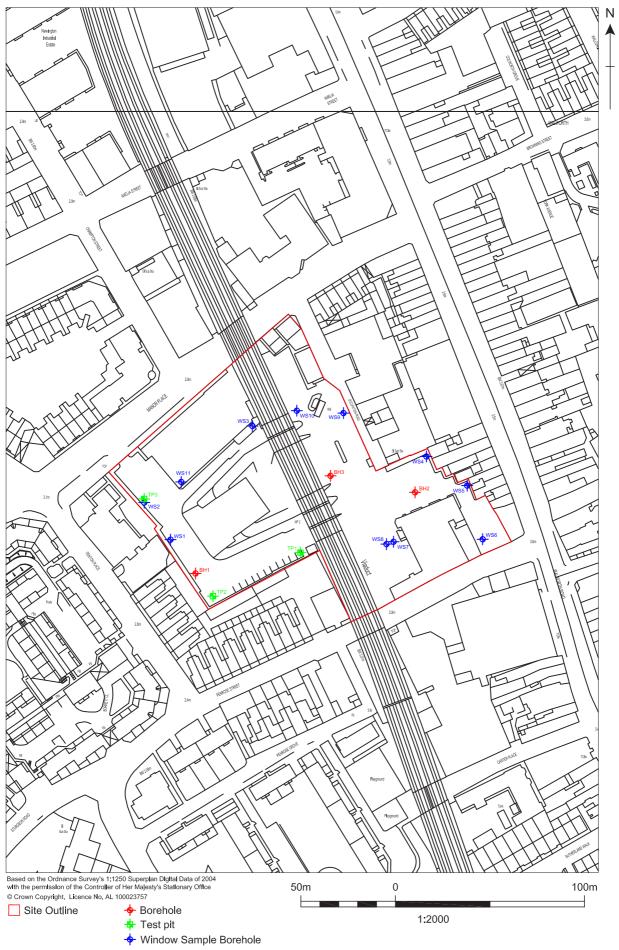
Detailed Site / Borehole / Test Pit Location Plan
